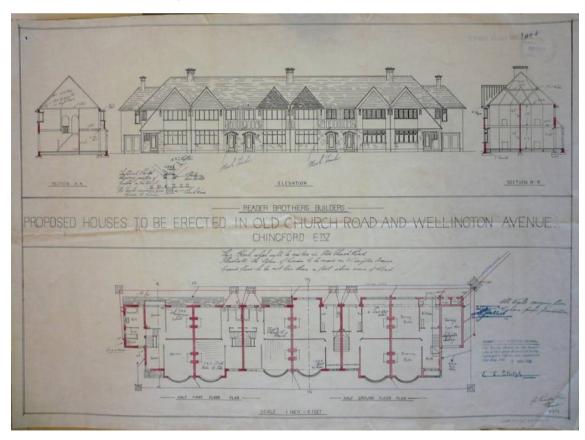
Drawings by Edgar Reader for houses in Old Church Road and Wellington Avenue, Chingford, 1932 (Reader Brothers Collection, LMA/4430/05/022, London Metropolitan Archives).
